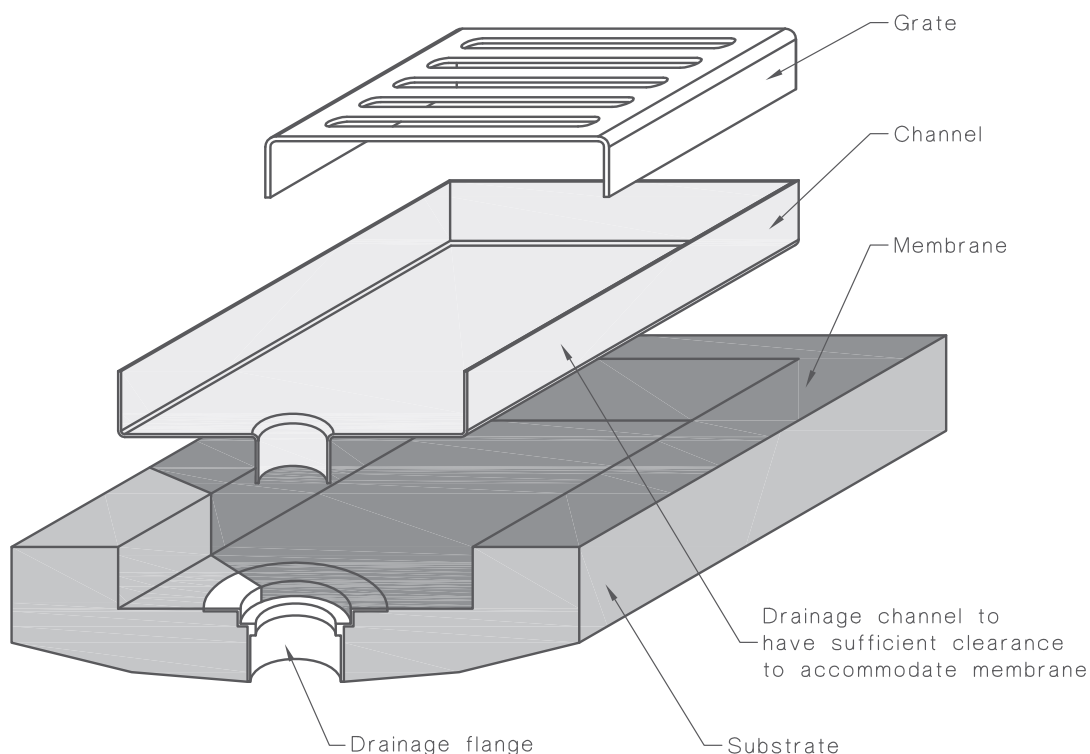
TYPICAL MEMBRANE TERMINATION AT DRAINAGE CHANNEL
